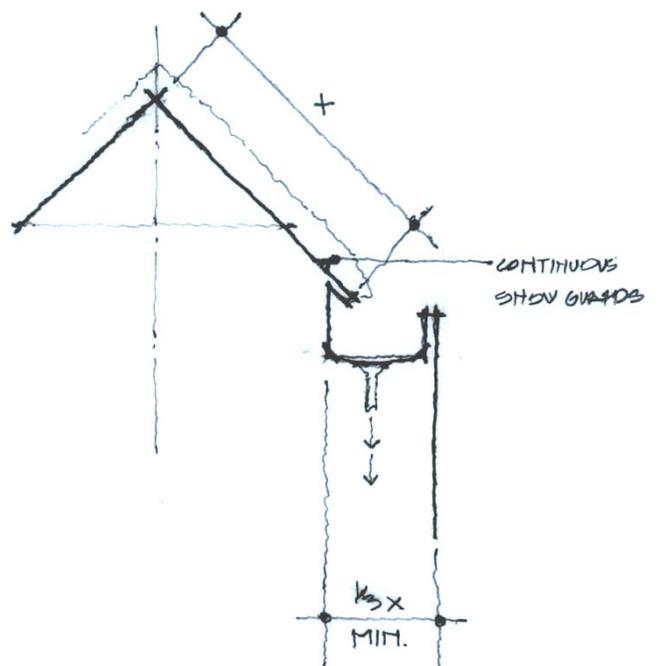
Flat-roof snow catchment and control areas shall be no less than an area 1/3 as wide as the tributary pitched roof surface.
